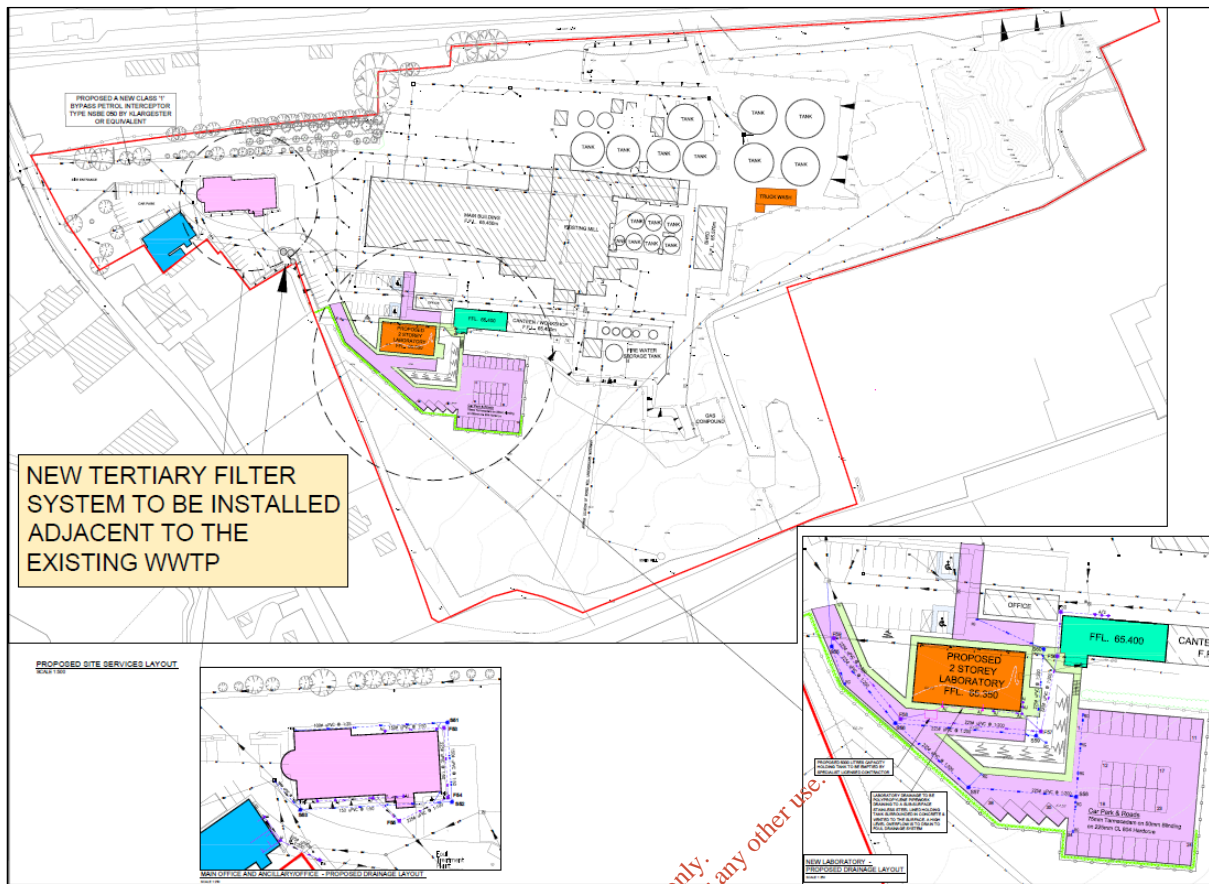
Proposed development to existing facilities at the site. Proposed development area highlighted. Refer to Proposal Drawing Reference Number: 16718-5051-B
